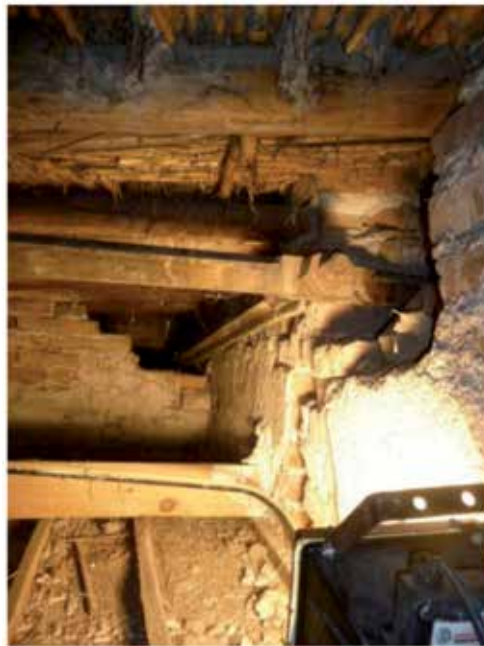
Bidirectional tensors for bracing of historic masonry walls, Fader House, 2013.
